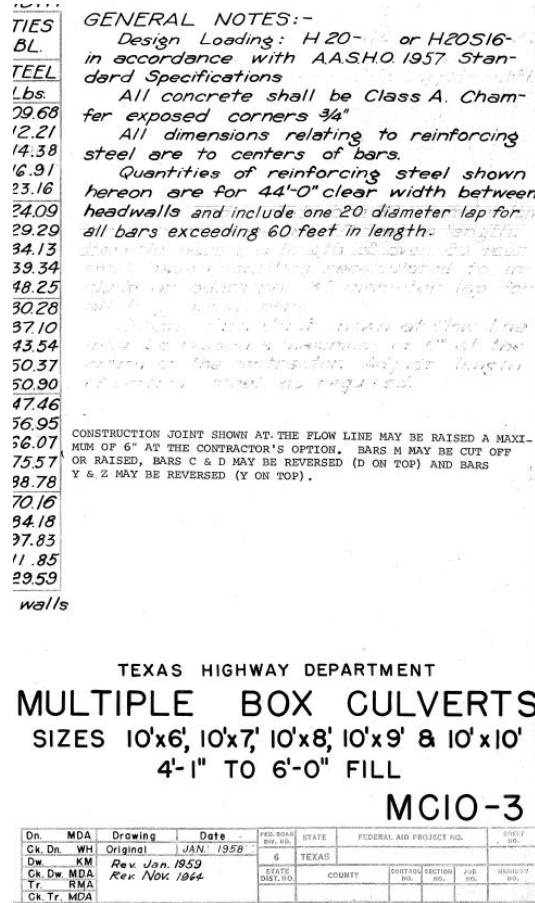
EXAMPLE CULVERT, TITLE BLOCK INFORMATION FROM PLAN SHEET.
